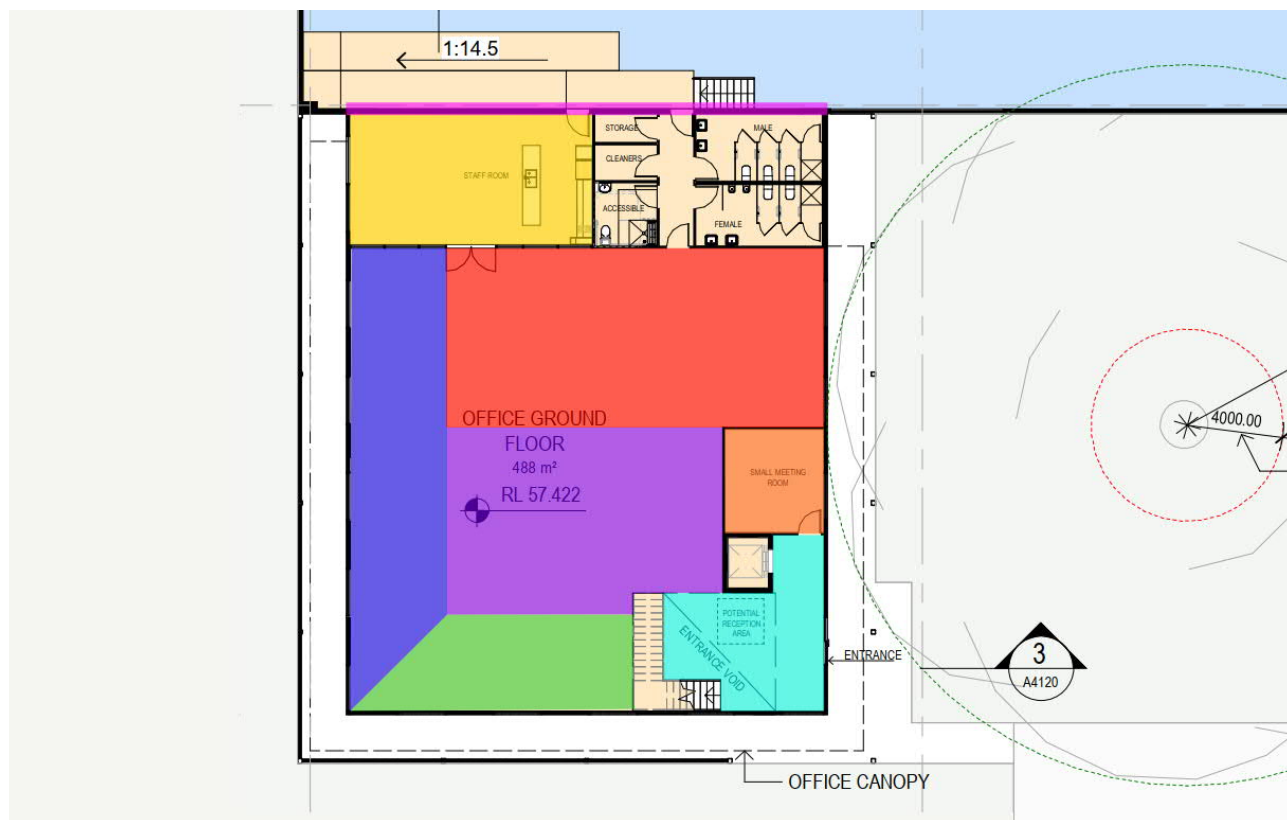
HVAC zones & thermal envelope for 1490 Centre Road Ground Floor
